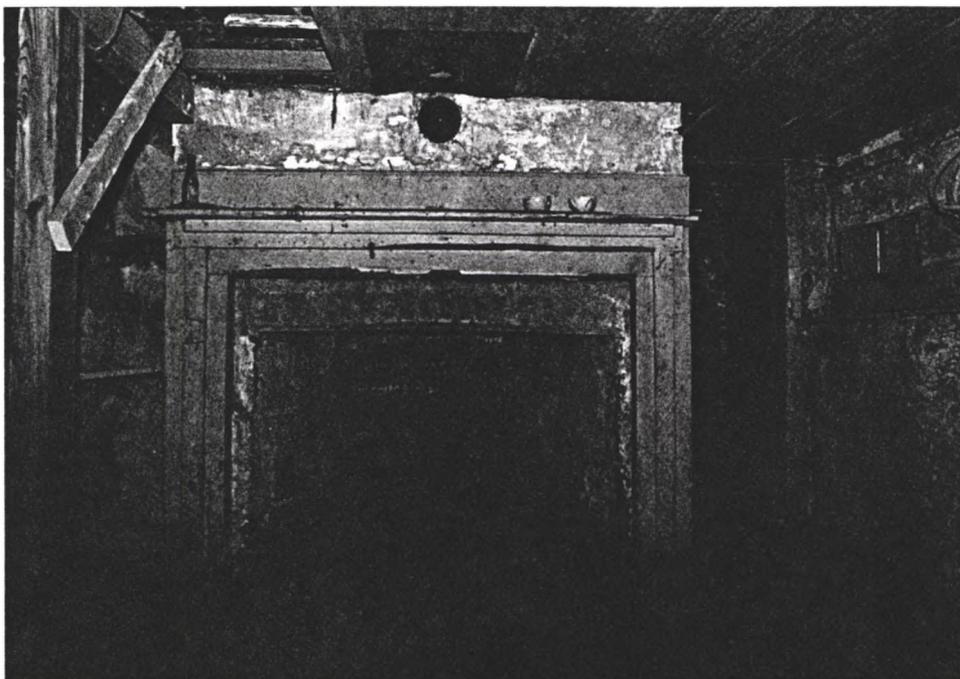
Basement cooking fireplace. Note horizontal stones of fireback.
